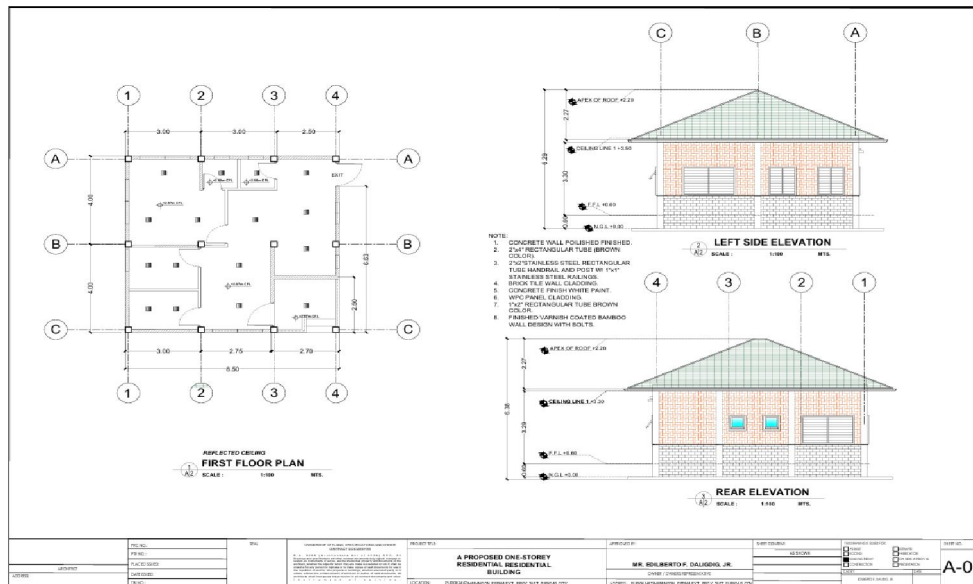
One-Storey A02 – Elevations and Exterior Finishes
